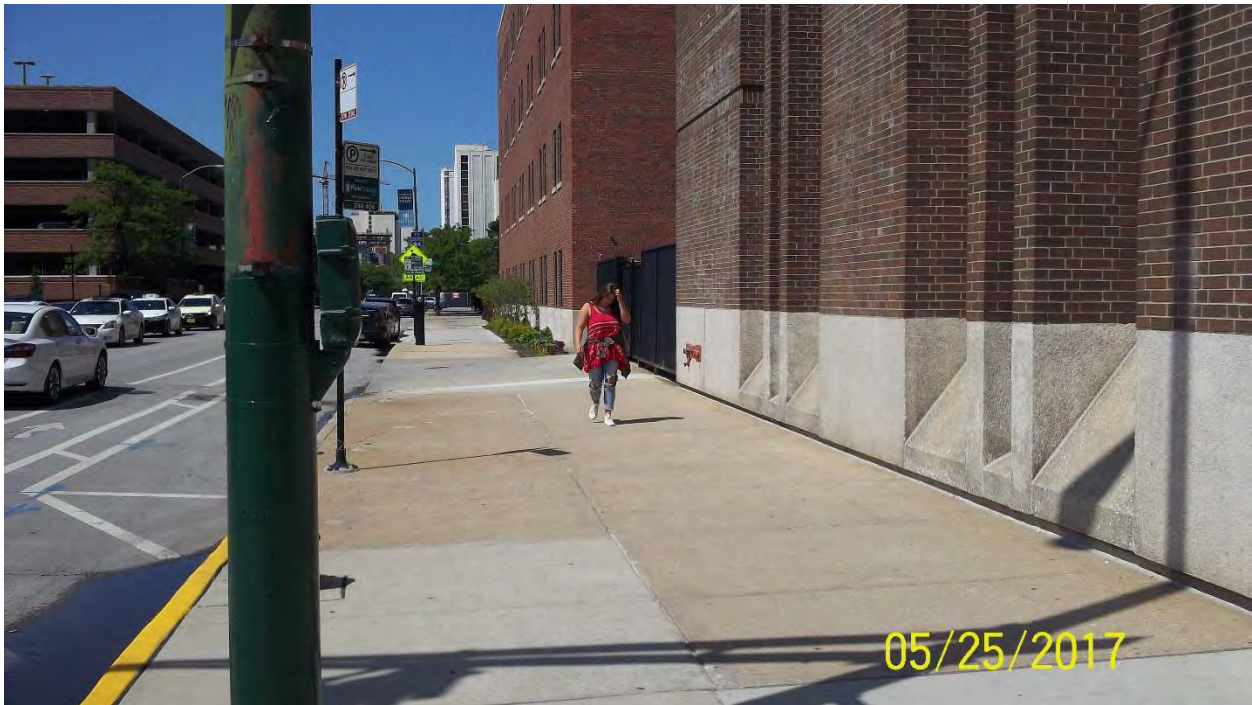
Northeast corner of Chicago Ave. / Wells St. – Looking North
